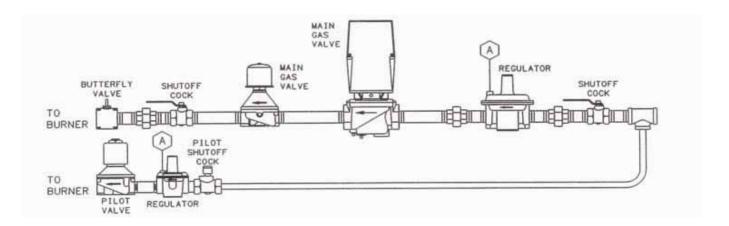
Typical U.L. Gas Piping Layout Model M 14-25
